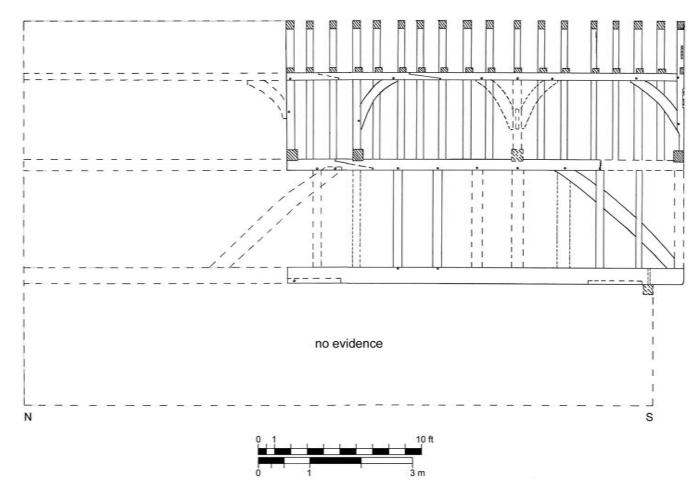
West elevation of 60-5 East Street (corpus no. 23), Part A (14th century). Drawn by Richard Shackle
